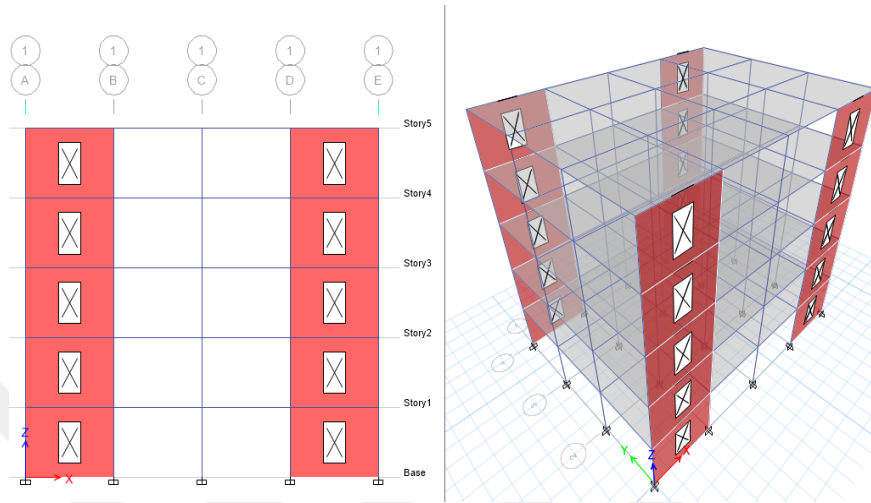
The 5-story building with concrete shear walls and with vertical openings.
